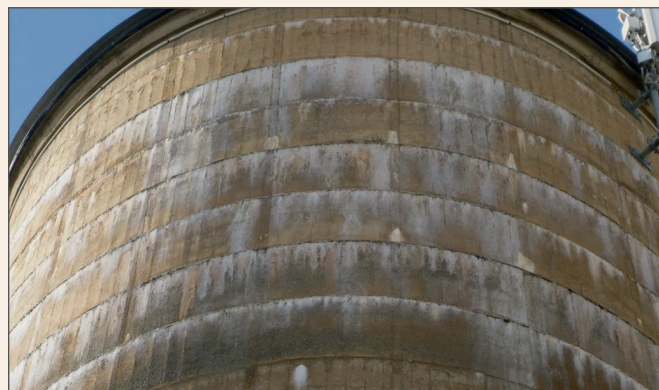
Water leakage and efflorescence at horizontal construction joints.
